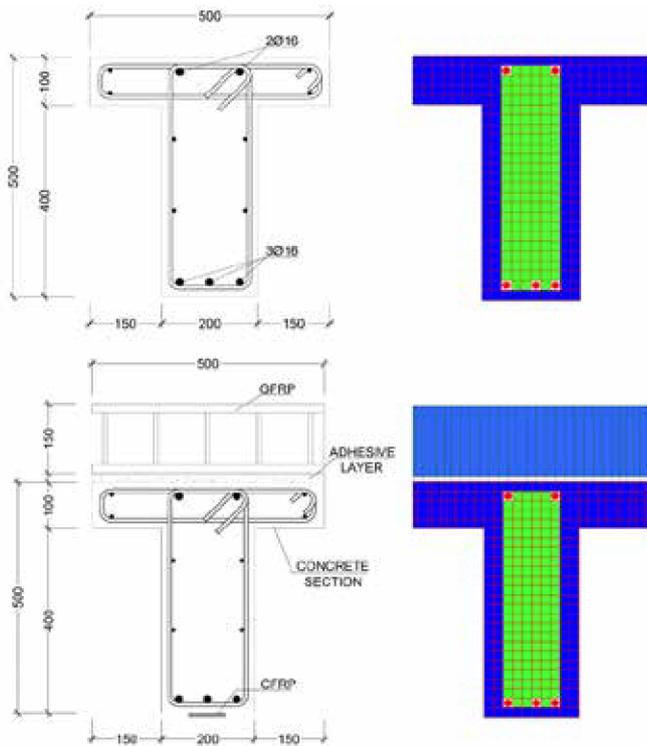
Cross sections and finite element models of the prototype beams (specimens 1 and 3)
